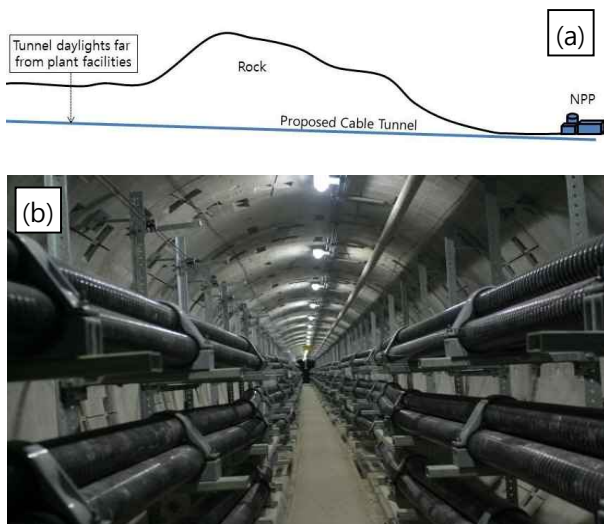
(a) proposed cable tunnel and (b) example of an underground tunnel for power lines [1].
